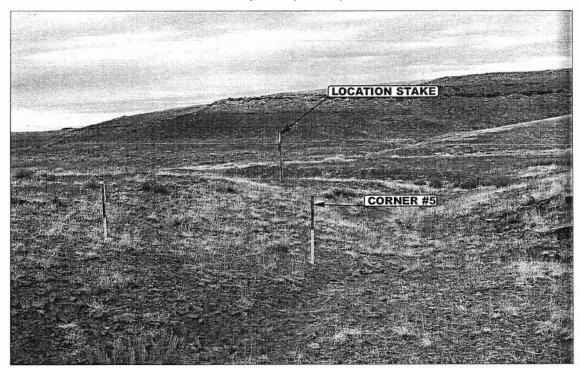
PHOTO: VIEW FROM CORNER #5 TO LOCATION STAKE
